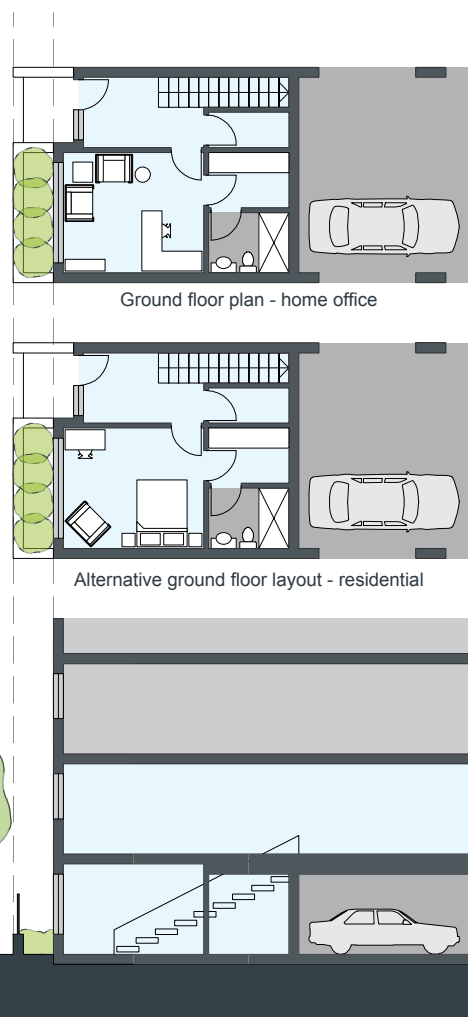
L.3 Plan and section of a double storey apartment which is directly accessible from the street
